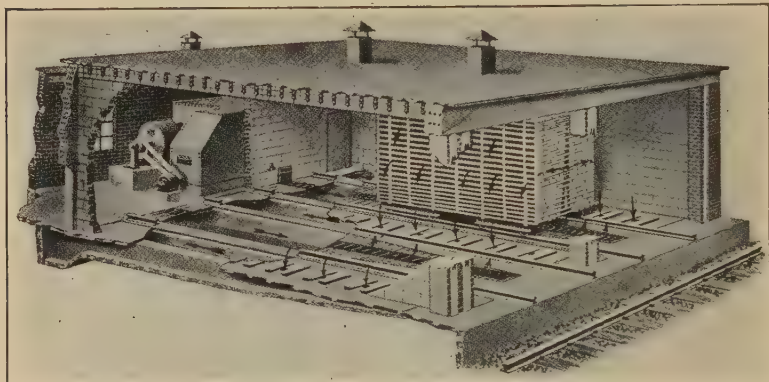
Sturtevant compartment blower kiln. (Courtesy, B. F. Sturtevant Co.)
